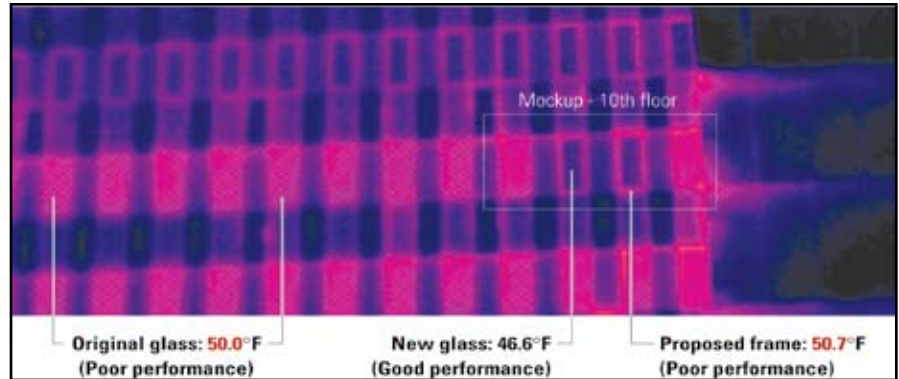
New glazed windows performed well, but new insulation was redesigned at the window attachment to reduce the thermal bridging apparent in this image.
